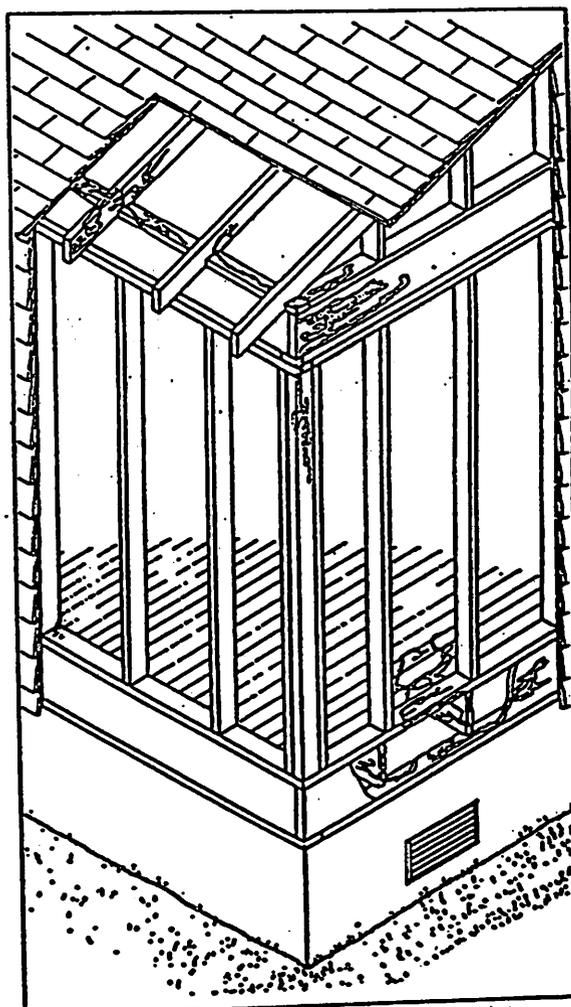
Drywood termite infestation in house attic and substructure.
